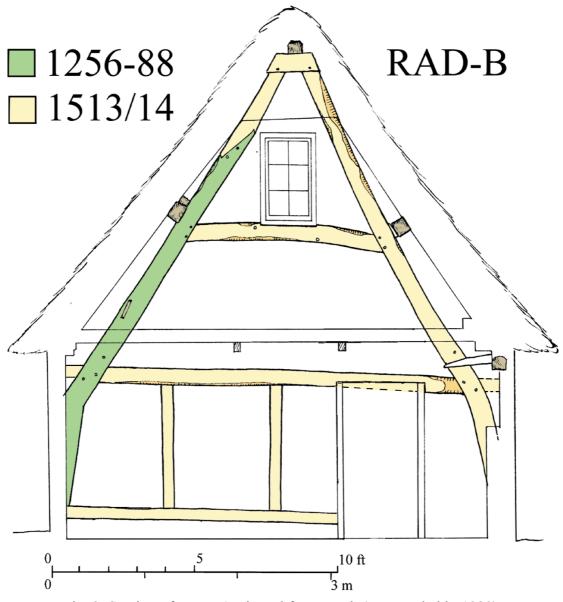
Section of truss T1, viewed from south (as recorded in 1989).
